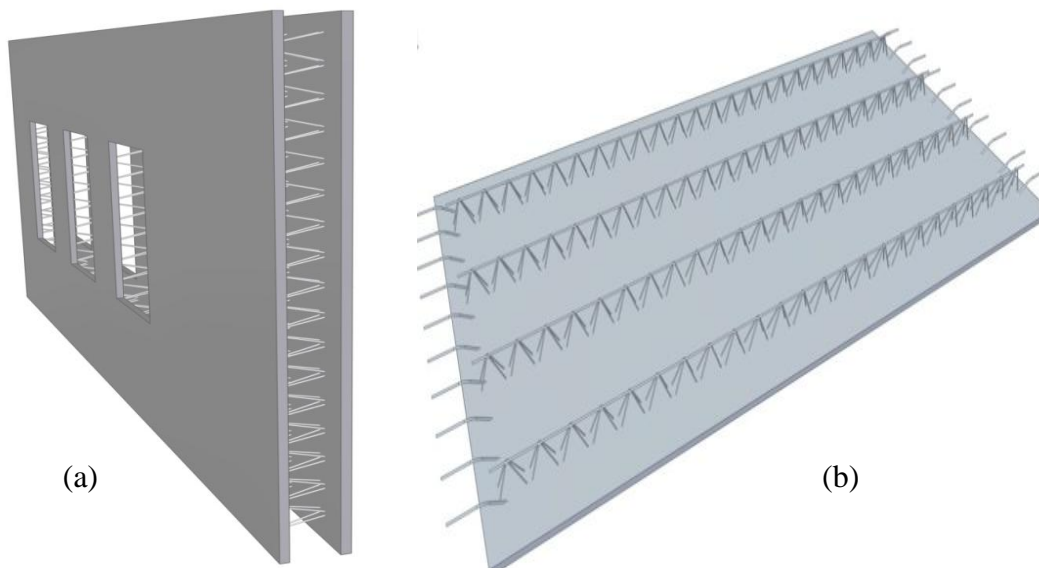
(a) Double Wall, (b) Filigree Slab
